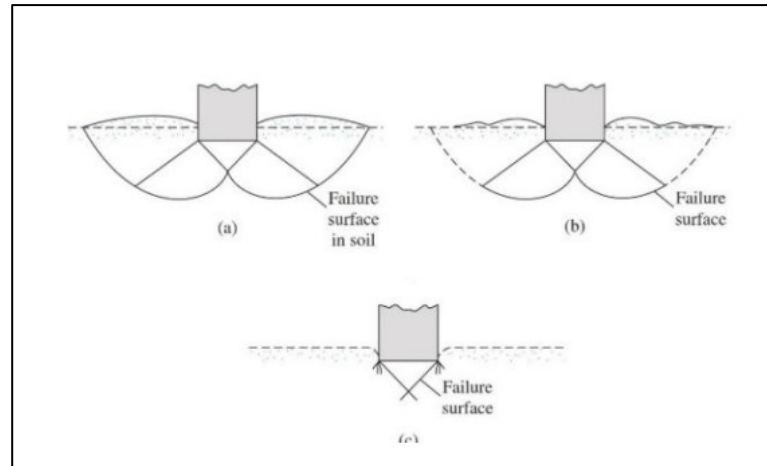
The failure mechanism of soil under shallow foundation; (a) general shear failure, (b) local shear failure, (c) punching shear failure
